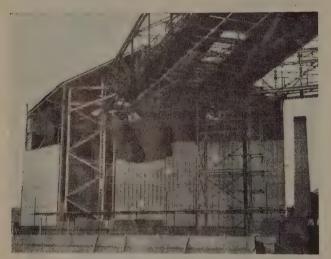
View under Bridge, Showing Tank House, Trestle and Original Gantry Tower
